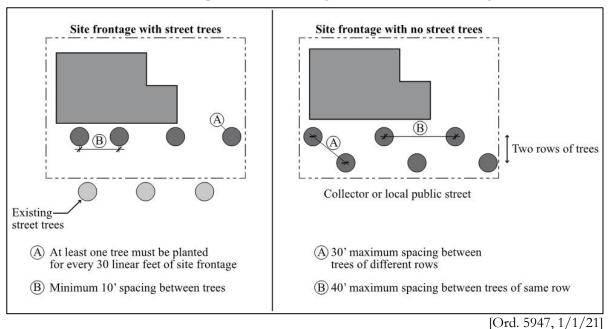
Required Tree Planting – Enhanced Landscaping Option
